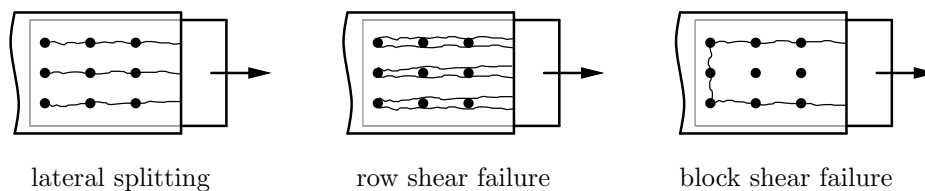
Typical brittle failure modes in multi-dowel connections.
